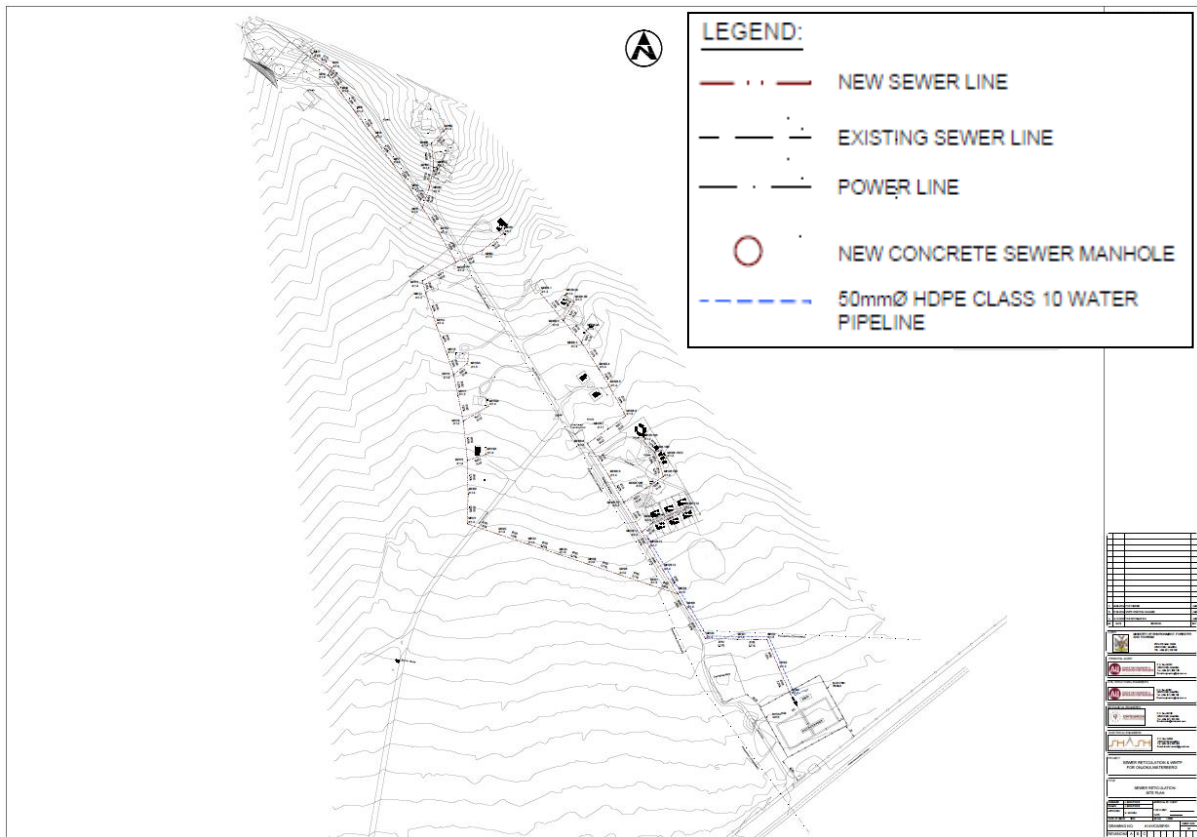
Sewer reticulation site plan (*AIJ Consulting Engineers & Infrastructure Managers*)
